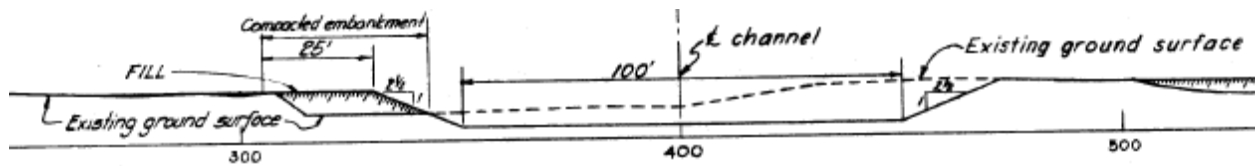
Channel Cross Section Station 100 Feet Downstream of Bolivar Road
